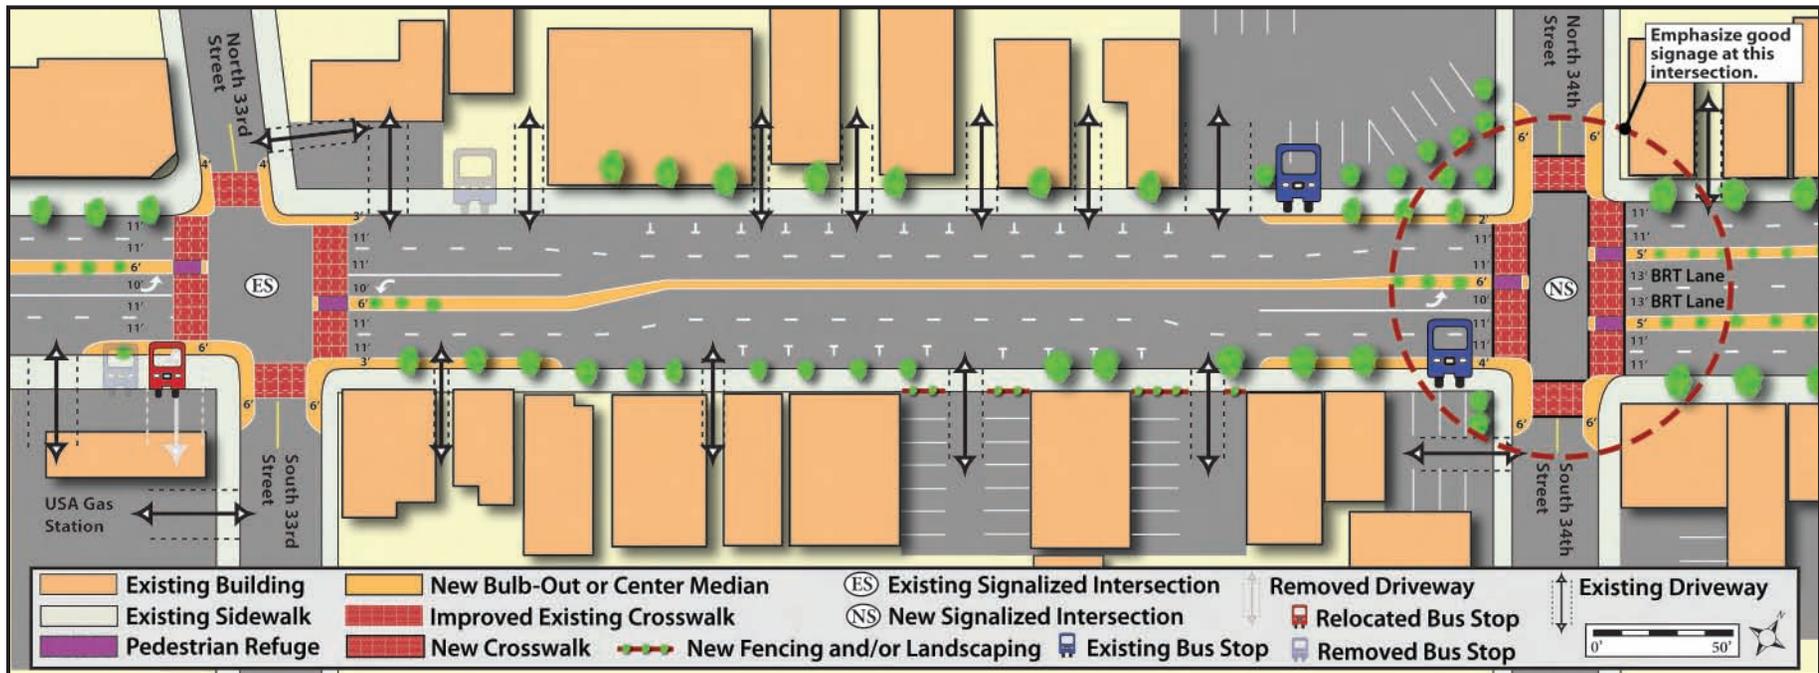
East Santa Clara Street/Alum Rock Avenue - Segment #8.
